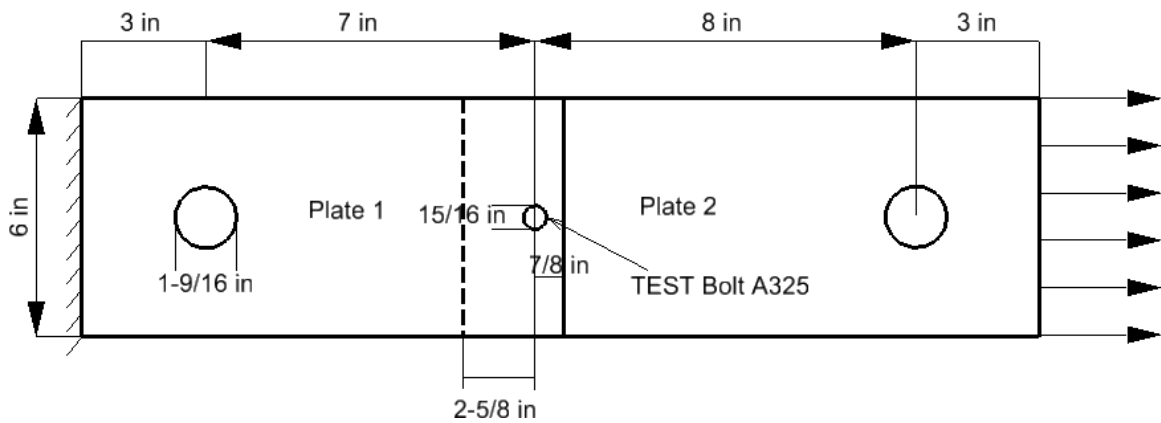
Single bolt connection setup and dimensions of Yu's test (Not in scale)
